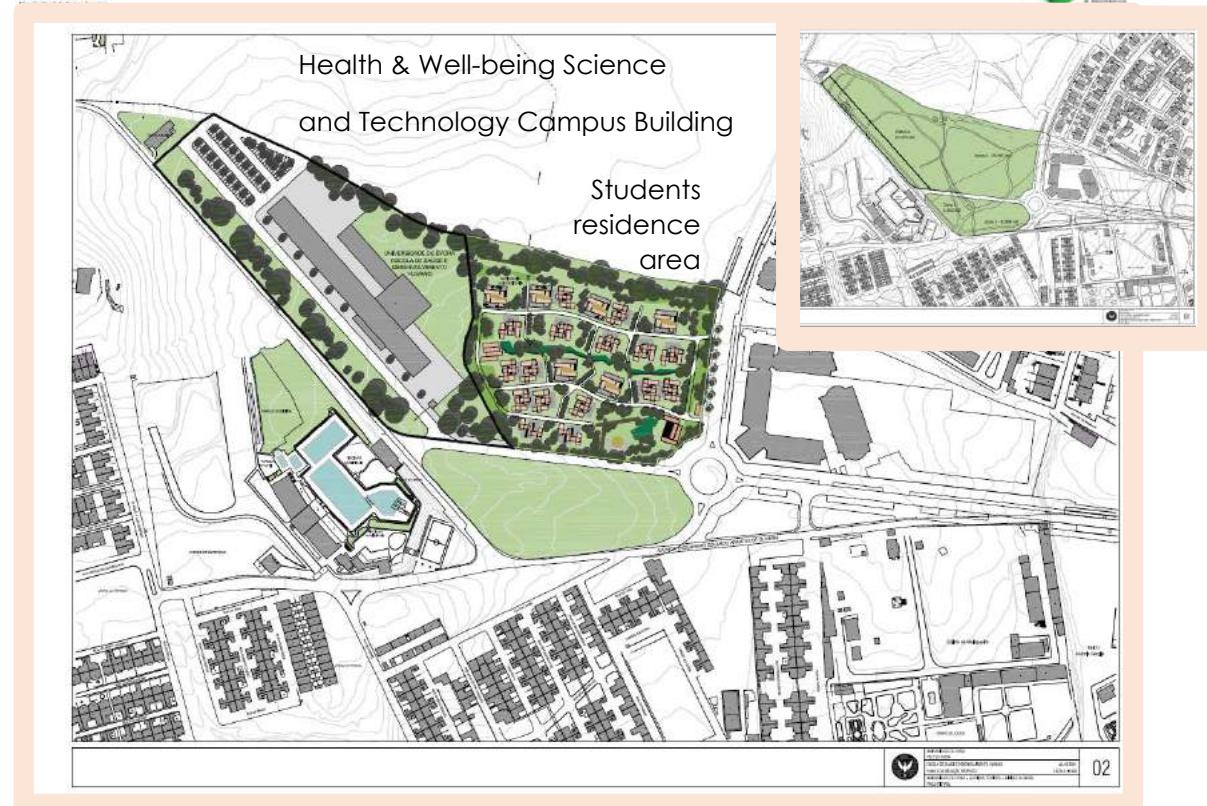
implantation plan of the new Health Sciences & Well-being Campus building
